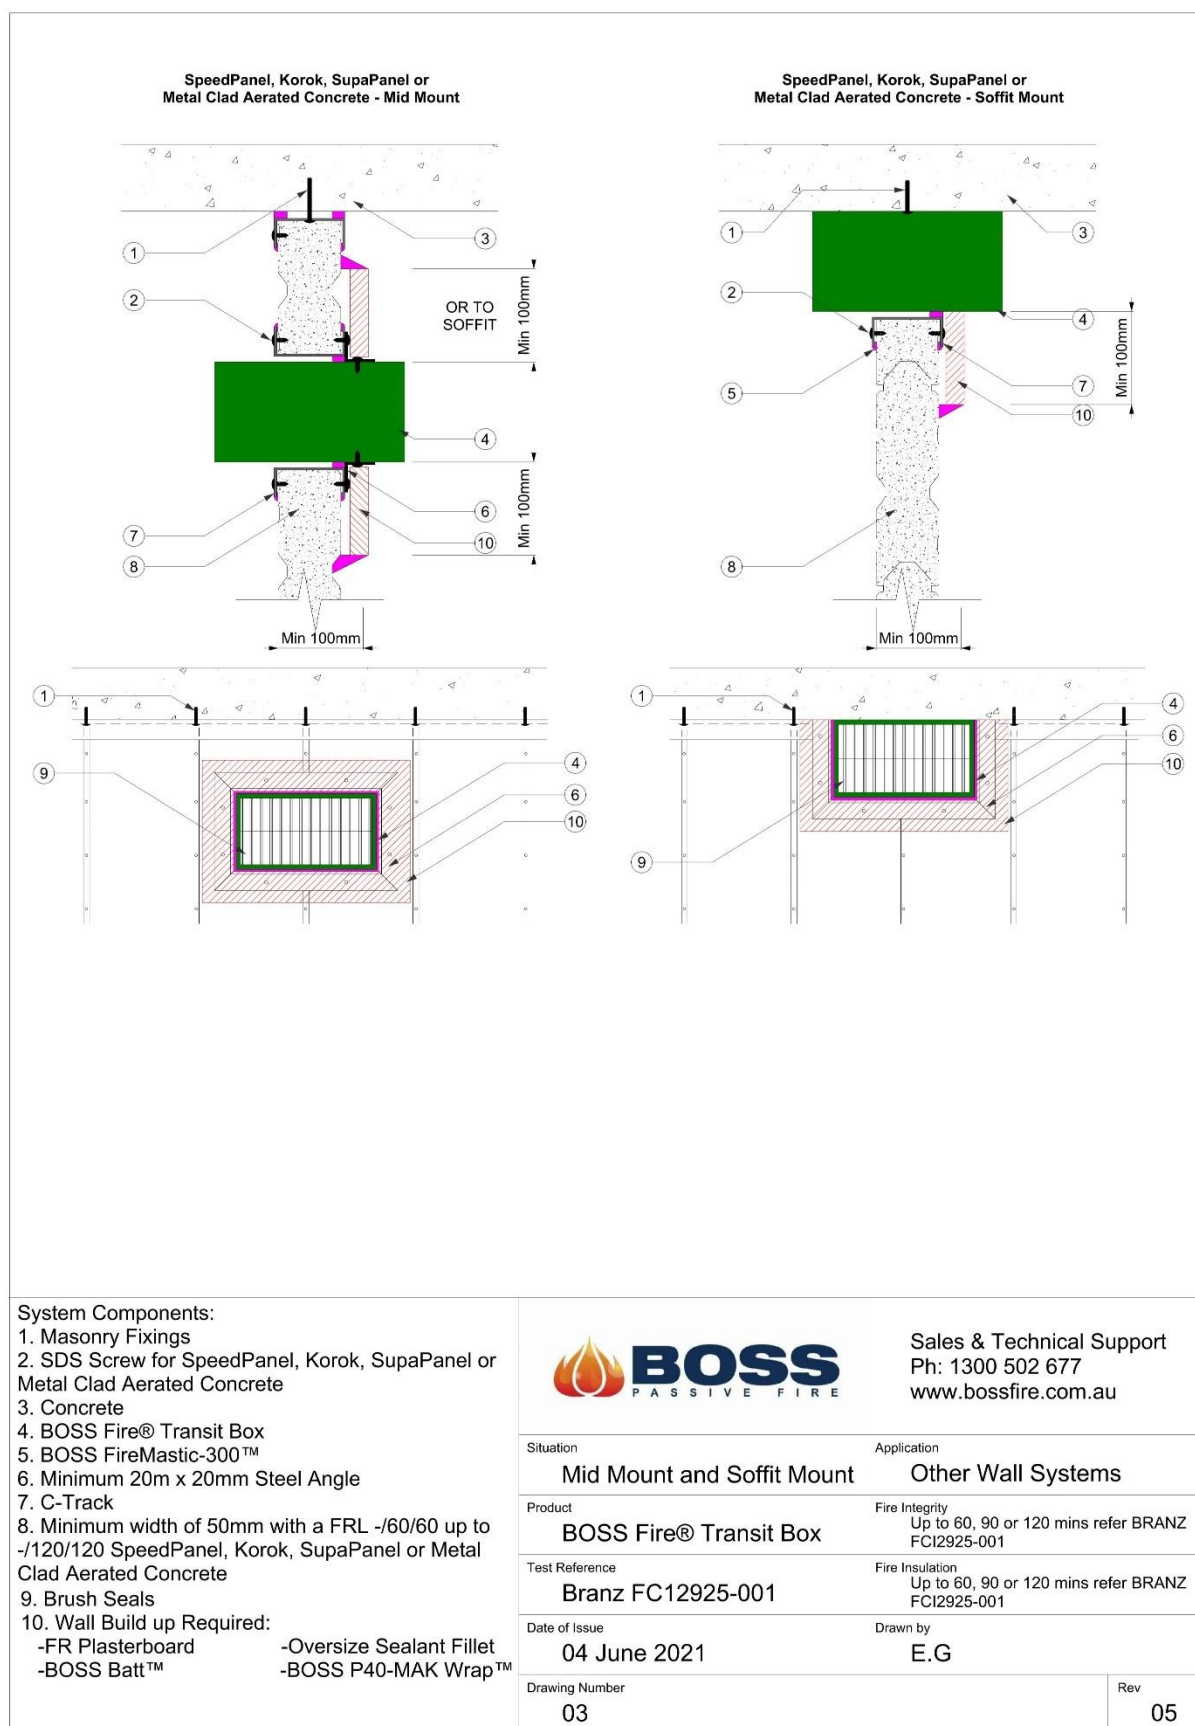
BOSS Fire® Transit Box – Mid & Soffit Mount in Concrete Systems
